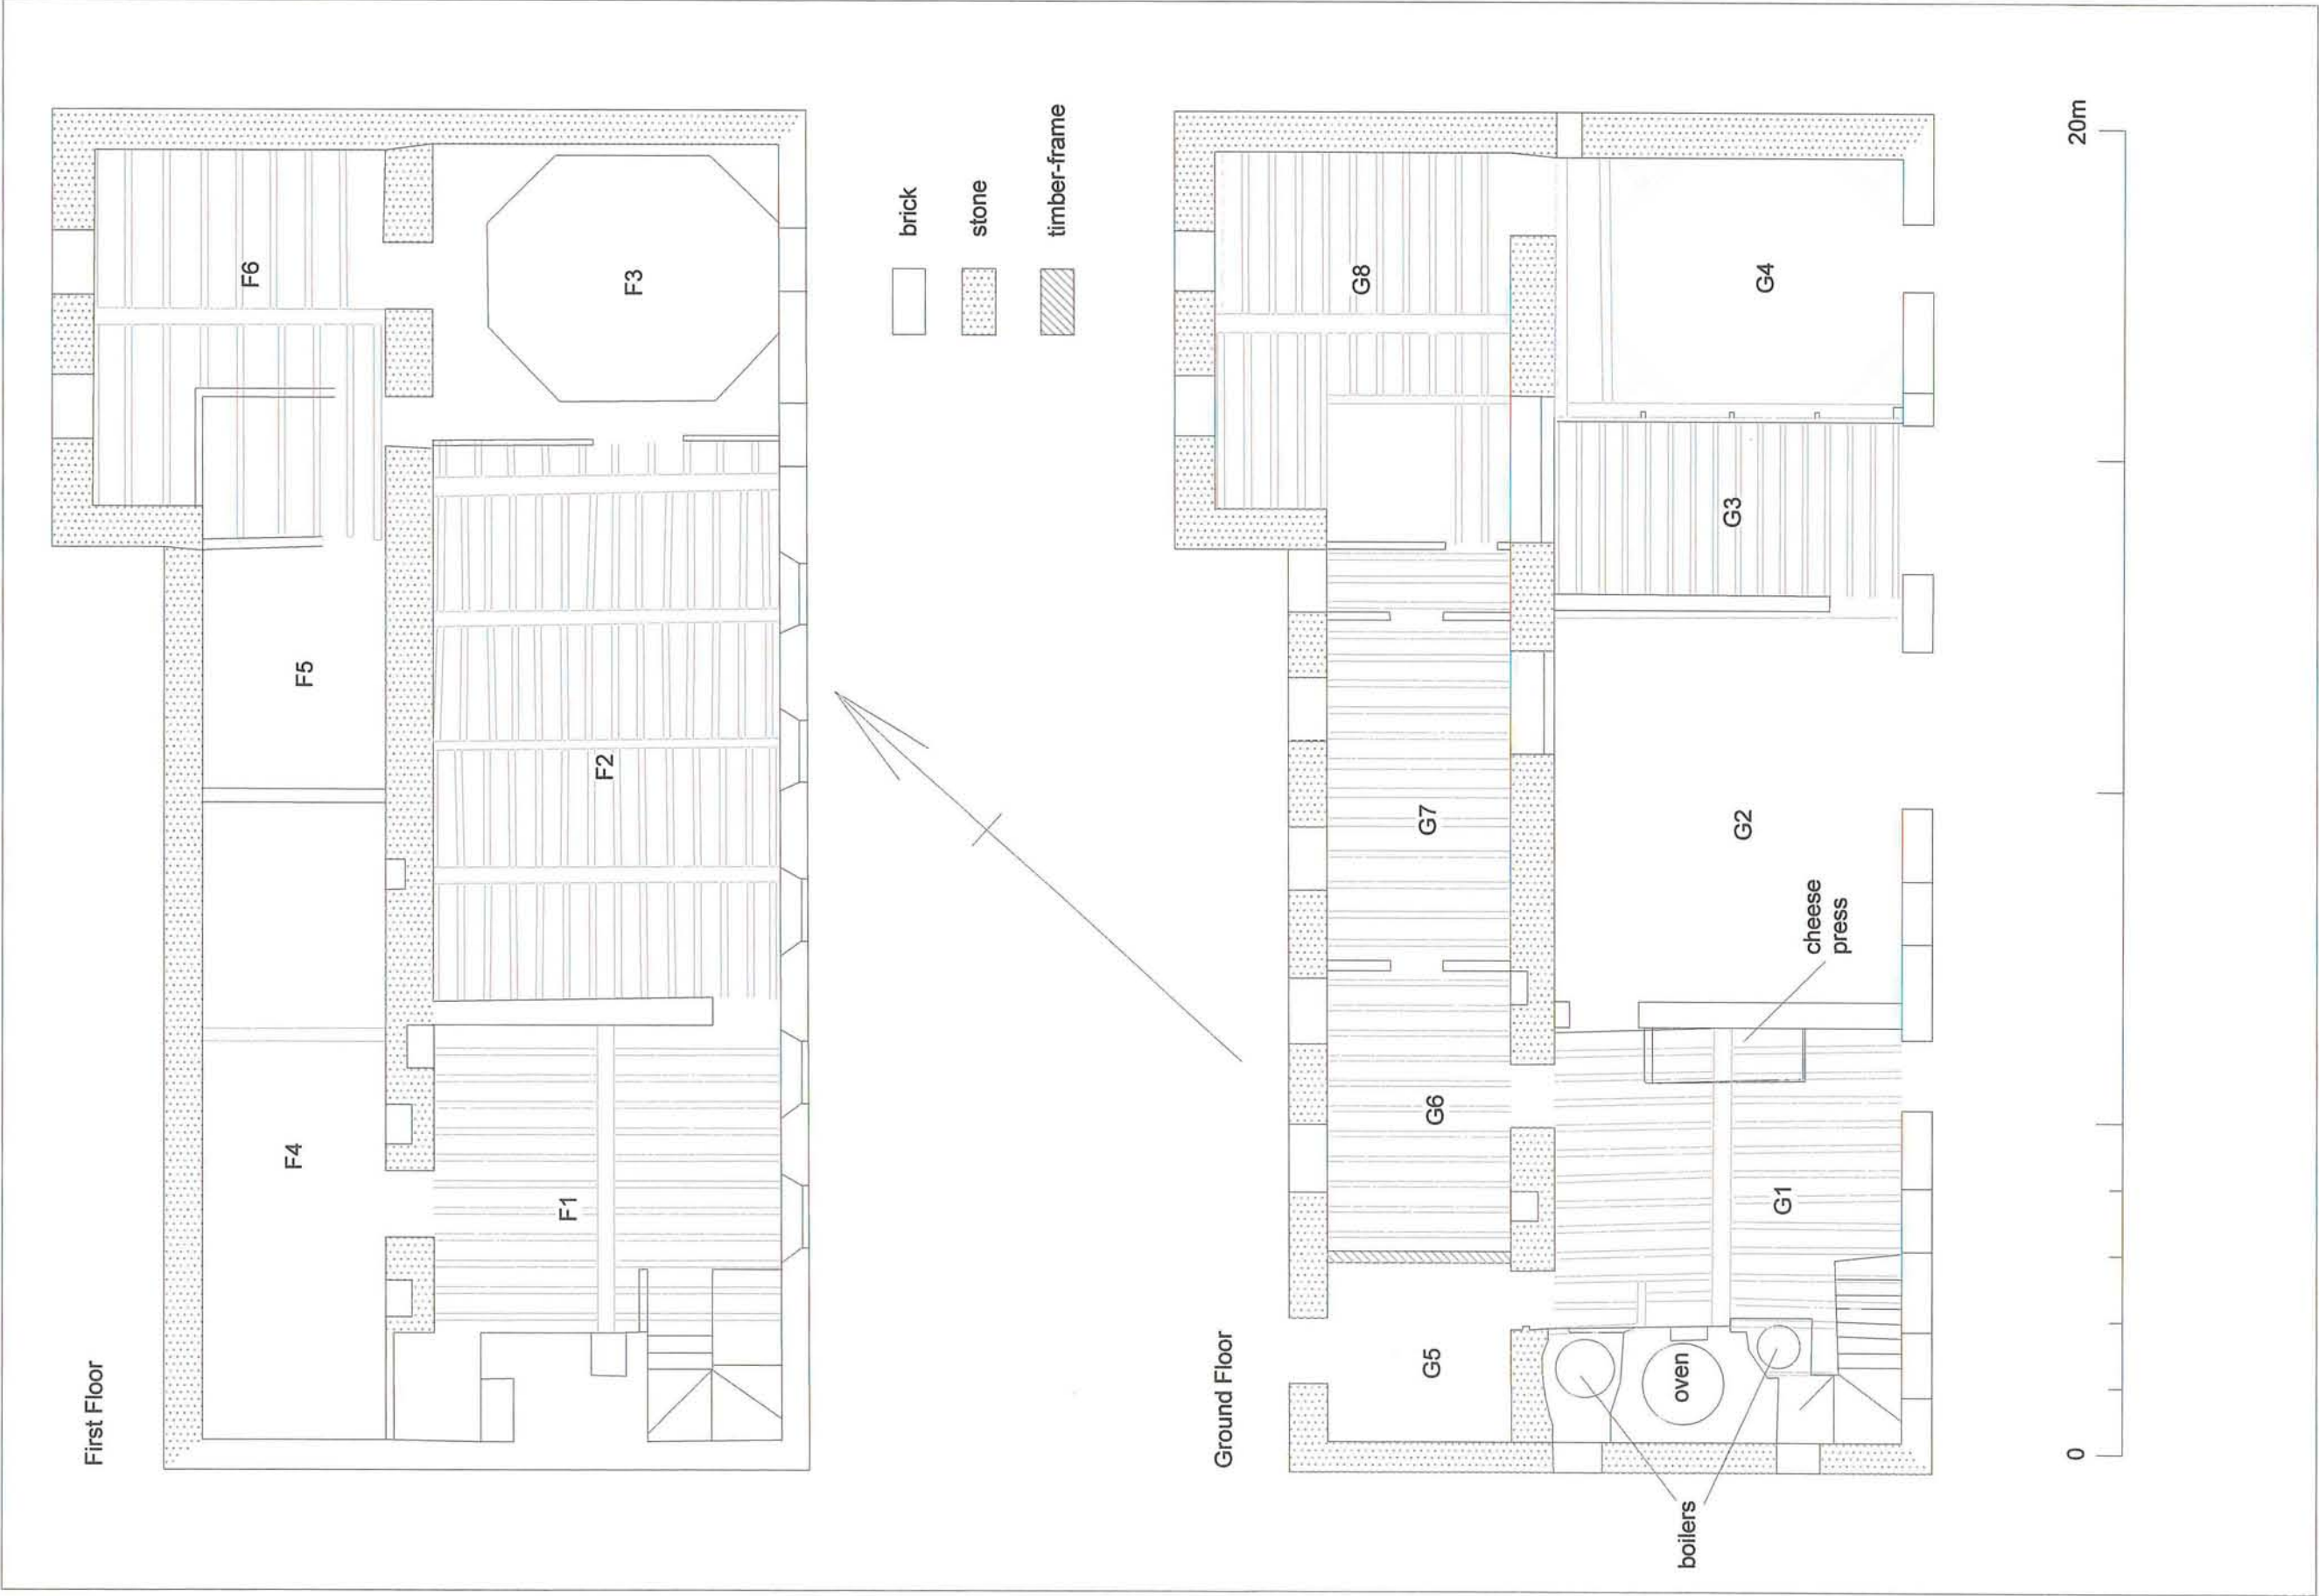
Barn 2 ground and first floor plans, scale 1:100
